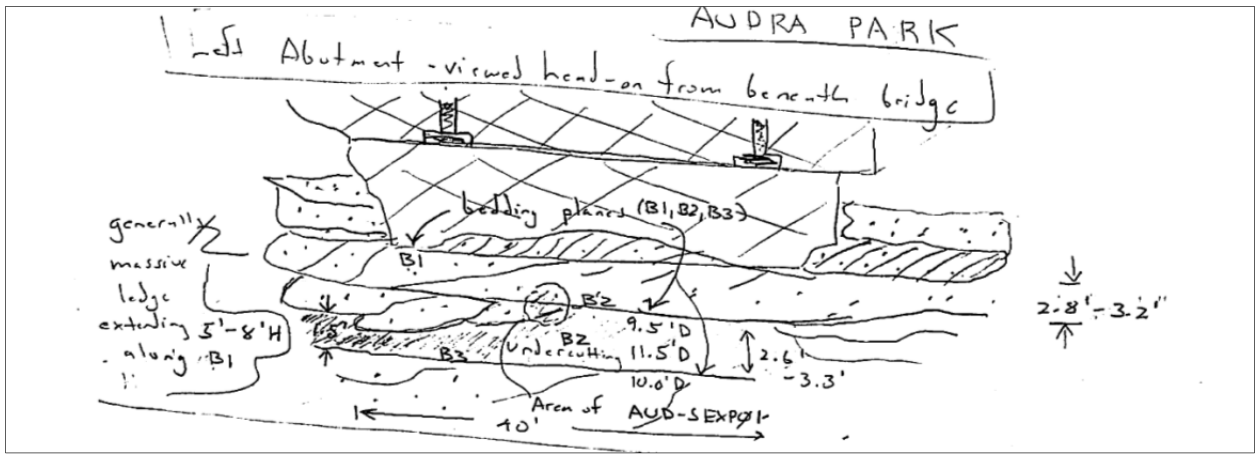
Field sketch of Audra Park Bridge, looking at left abutment.
